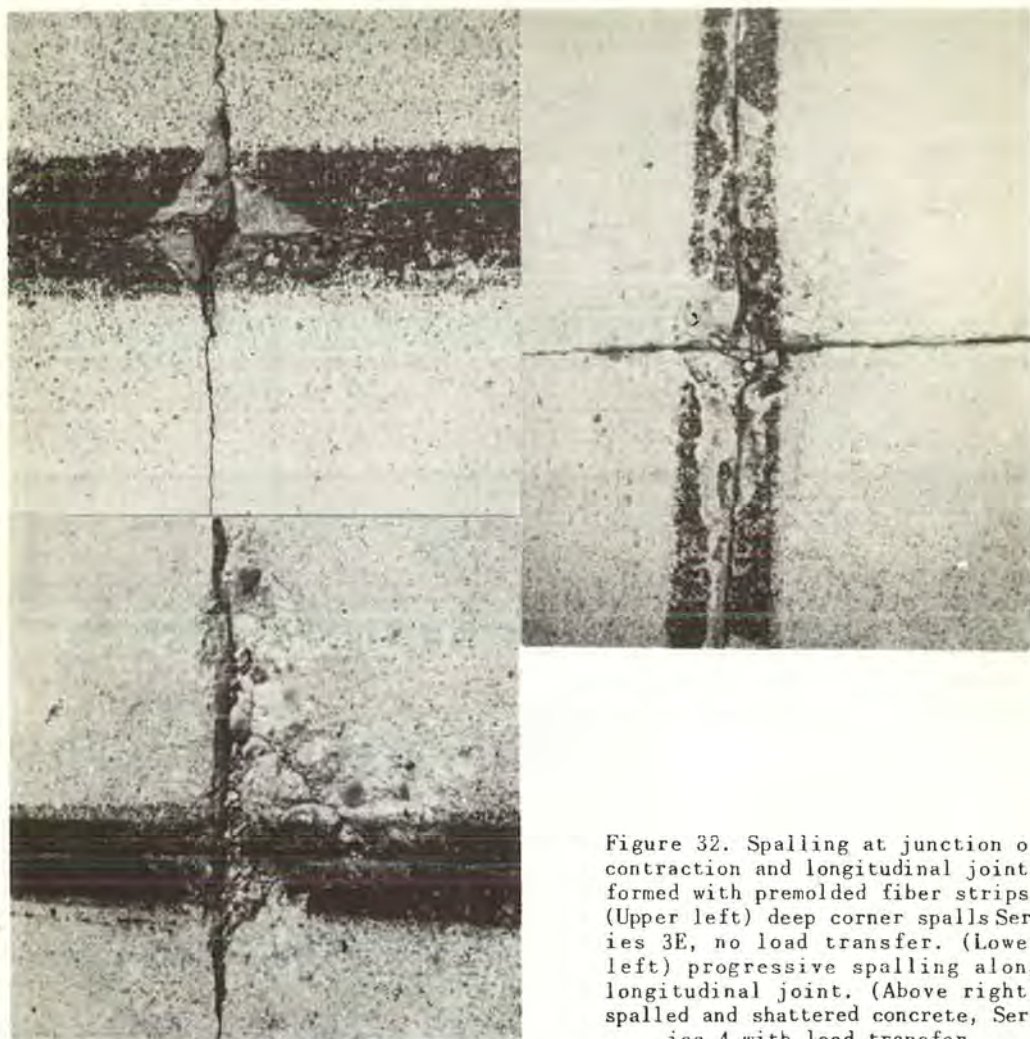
Spalling at junction of contraction and longitudinal joints formed with premolded fiber strips. (Upper left) deep corner spalls Series 3E, no load transfer. (Lower left) progressive spalling along longitudinal joint. (Above right) spalled and shattered concrete, Series 4 with load transfer.
